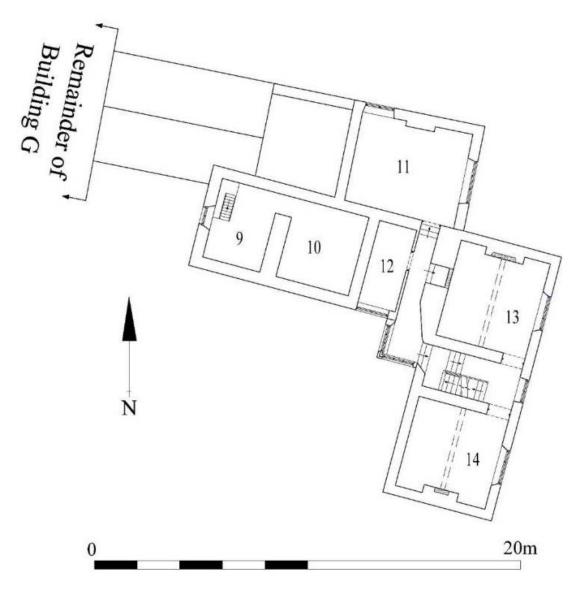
Main House and Buildings H and I first floor plan Modified from David Granger Architects drawings
